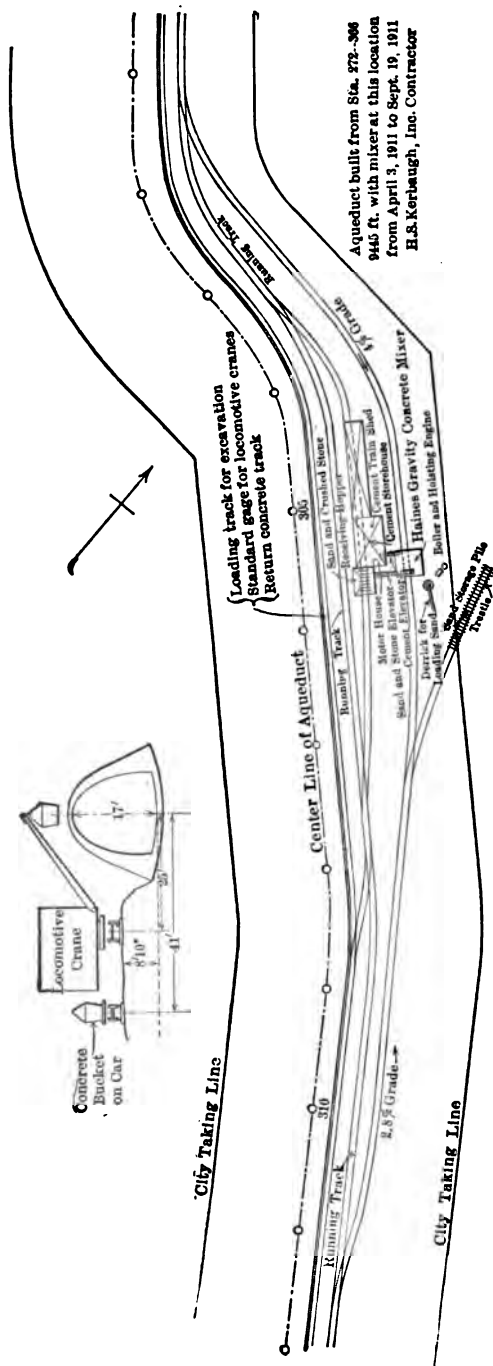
Contract 11. Diagrammatic Layout of Haines Concrete Mixing Plant on Section 2. This was the most successful plant on Contract 11. 9445 feet of aqueduct were built in one season with concrete from the plant. Shows method of placing concrete with locomotive crane.
